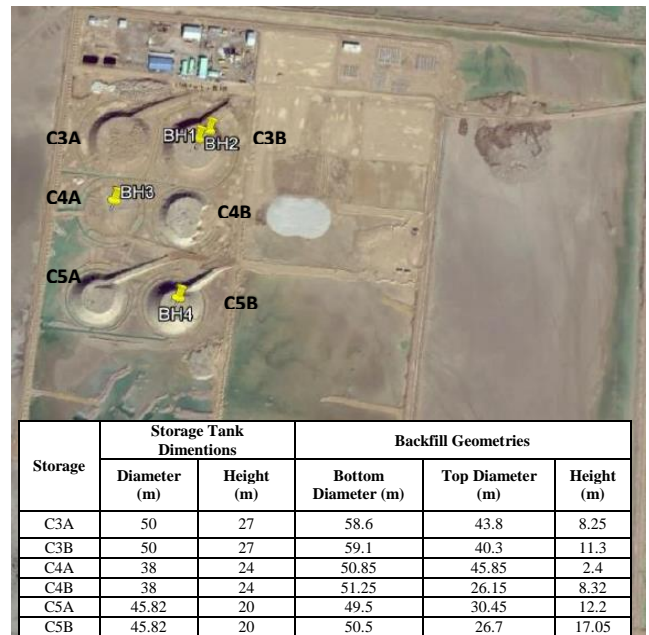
Plan view of preloaded zones, dimensions of tanks and backfill geometries.
